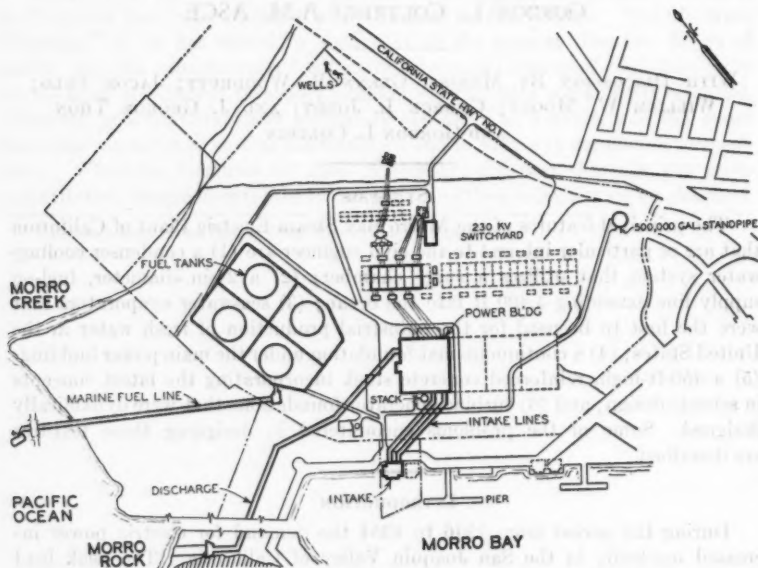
SITE PLAN FOR MORRO BAY STEAM PLANT, CALIFORNIA
